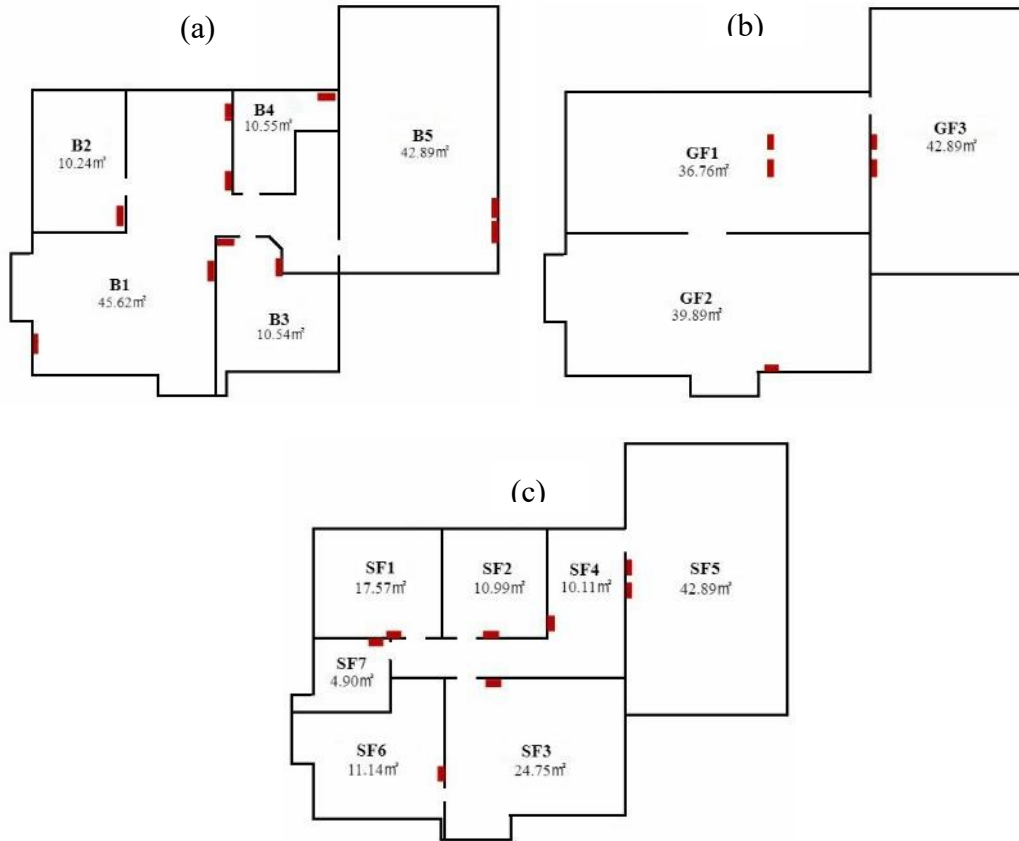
Floor plan of the house (a) basement, (b) ground floor and (c) second floor
